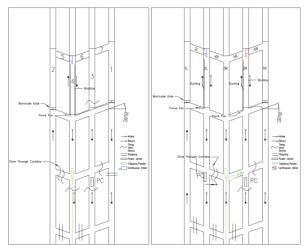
Left: Typical single CM main development section setup; Right: Typical supersection main development section setup
